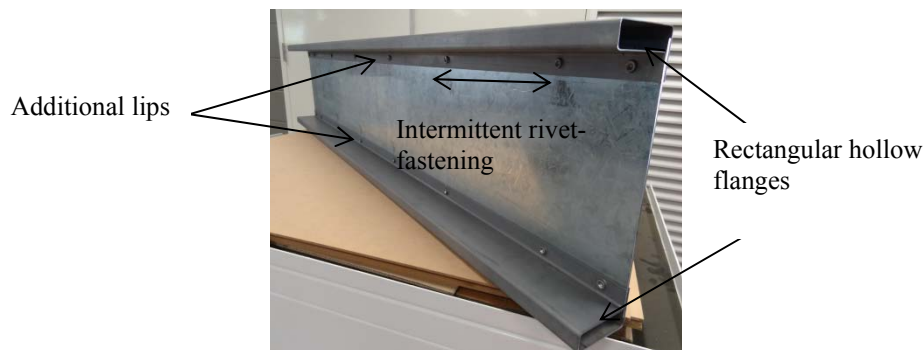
Rivet-Fastened Rectangular Hollow Flange Channel Beam
